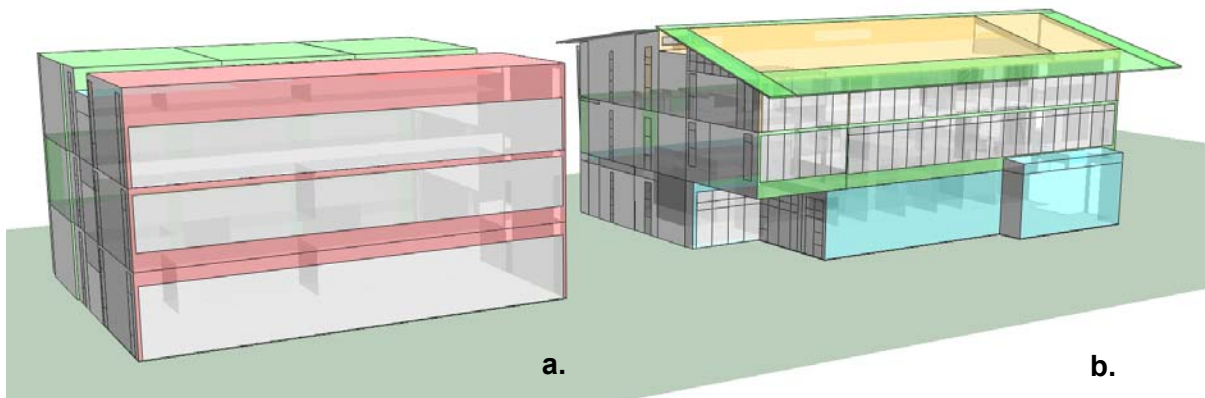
North façade of the Test building (a) and the Arts building (b)
